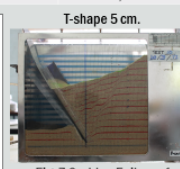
Sudden Failure of T-shape 5 cm. Wall
